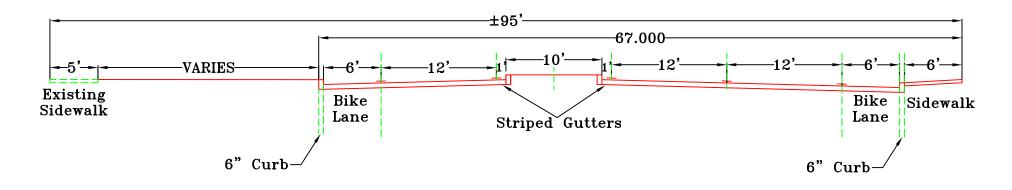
Proposed Modifications West Broadway - Clinkscales/Manor to Stadium
